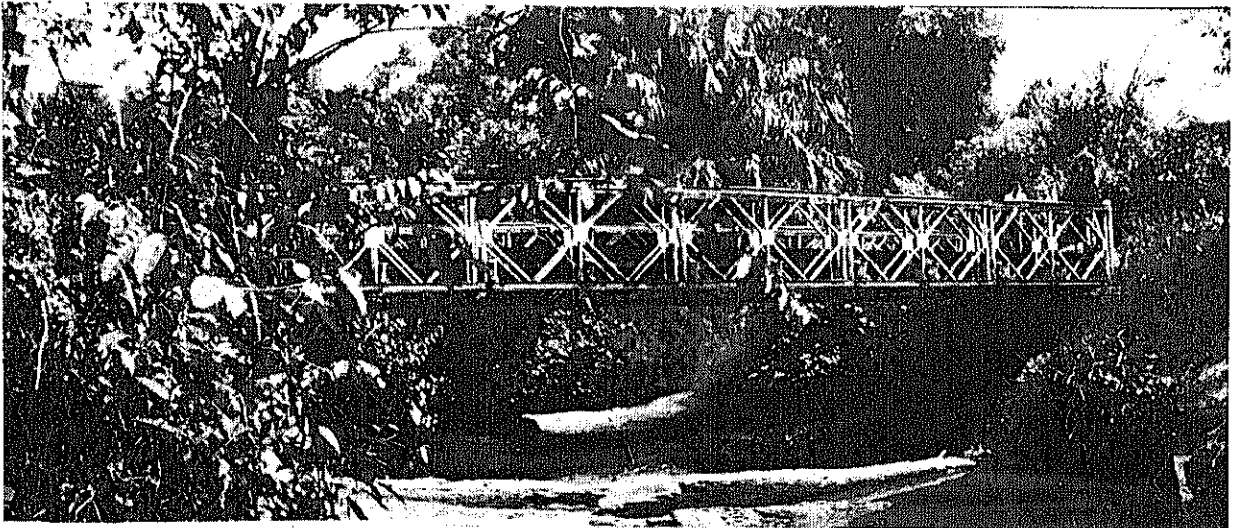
Kole River 1st Bridge at PK 204 (single lane bally trussed type)
